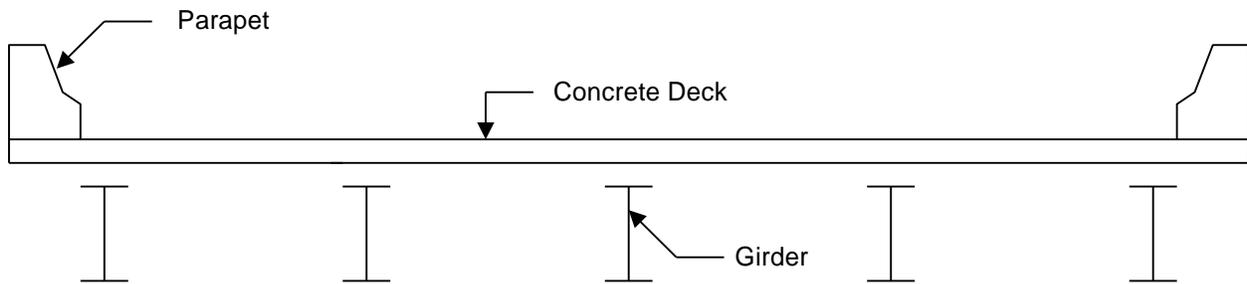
Schematic Cross Section of a Multi-Girder Steel Bridge
